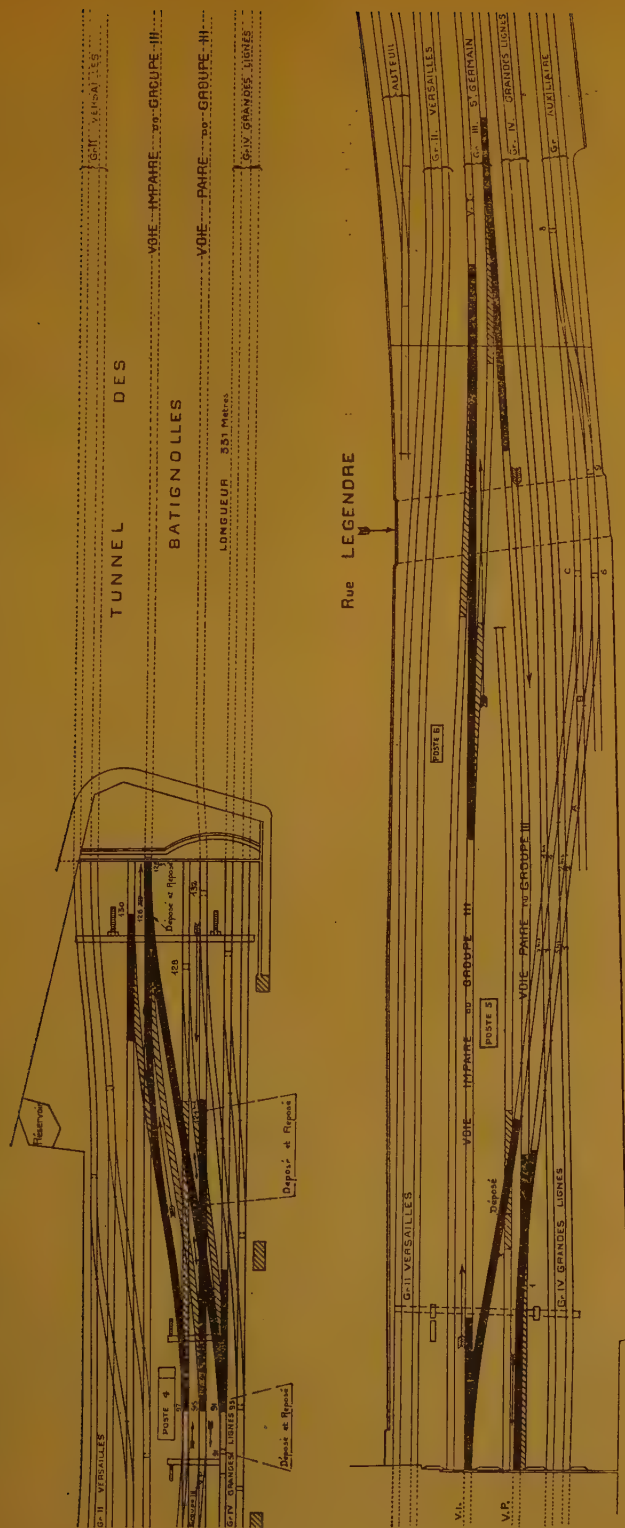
Opening out of tunnels. — Alterations to track when passing from the second to the third stage.
